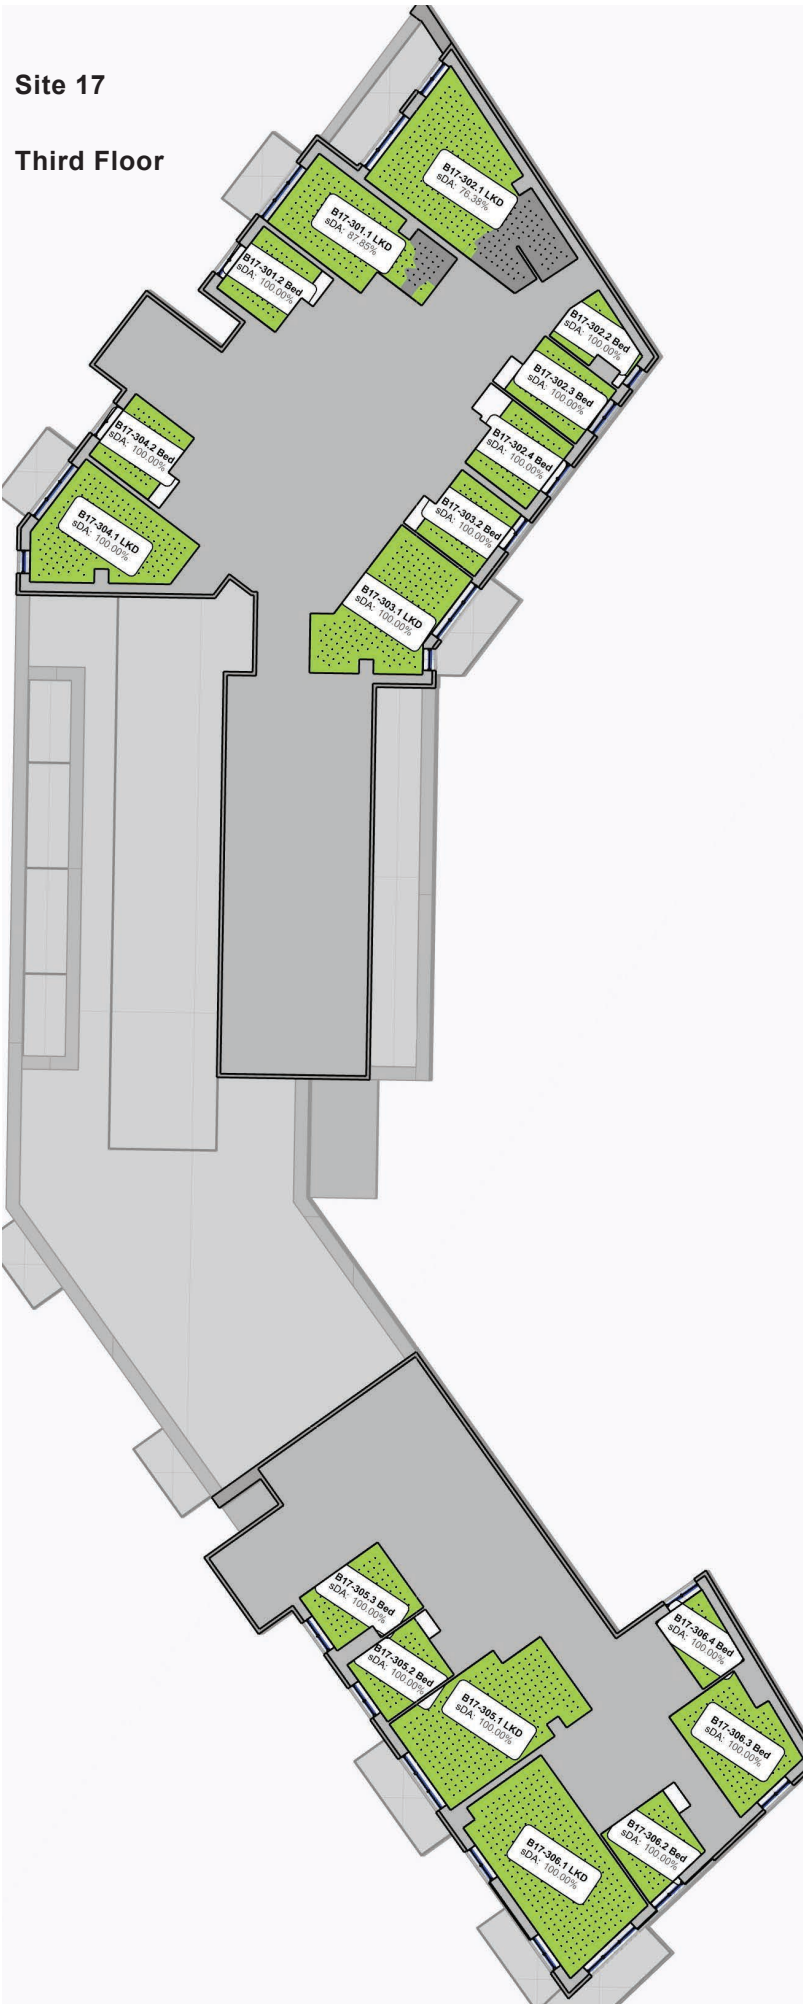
Site 17 - Floor plans indicating Daylight Provision to BS EN17037:2021+A1 Table NA.1
